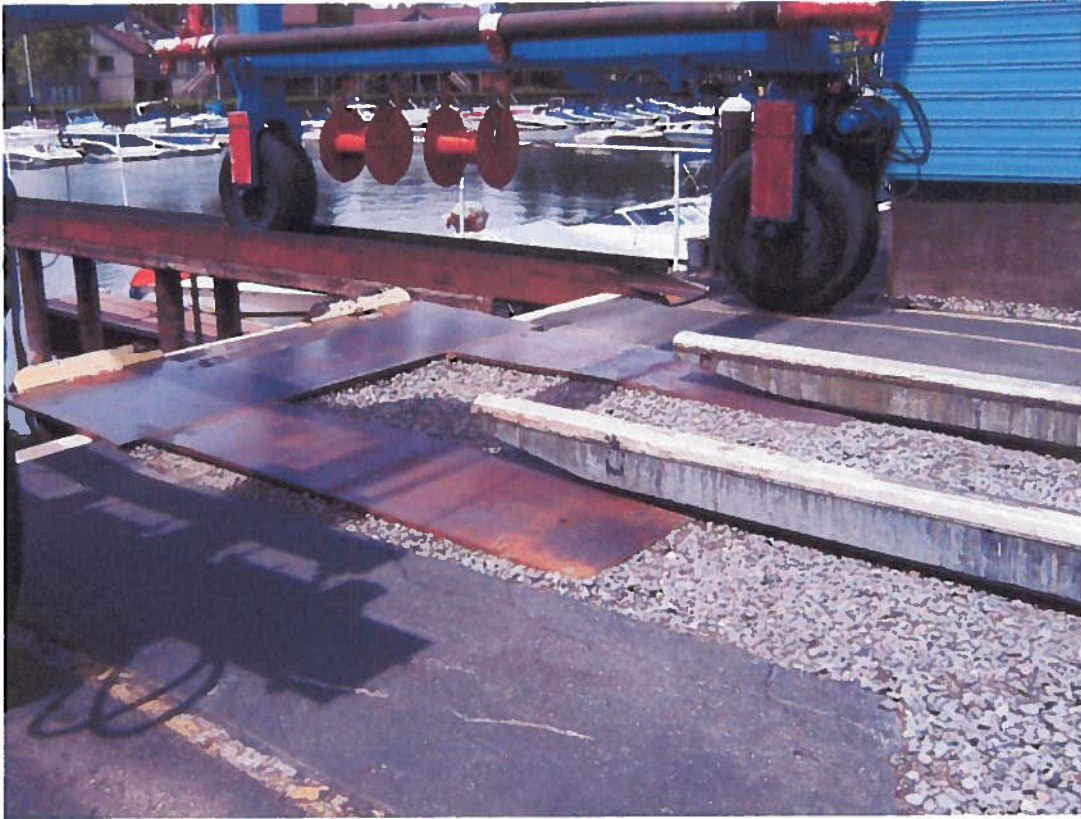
Drain rock behind bulk head at the boat lift unit. Facing northwest.
